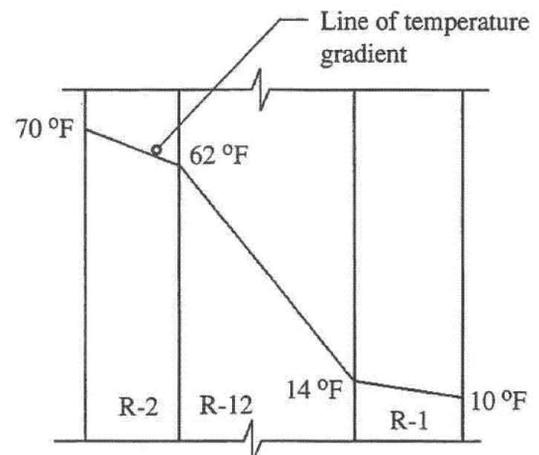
Temperature gradient superimposed over the section of a multi-layer assembly.
